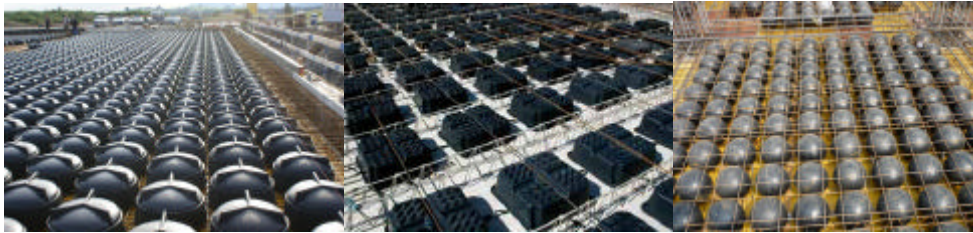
Details of constructive systems for reinforced concrete floor with bell-shaped, cubic and spherical voids
